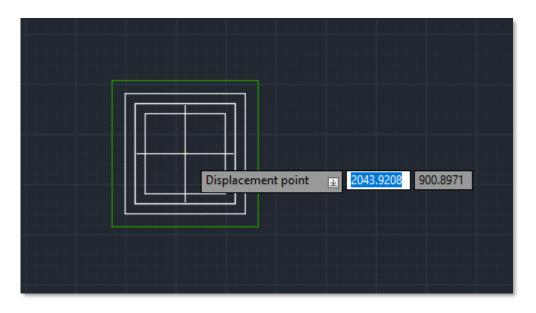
Exhaust roof hood product placement in AutoCAD drawing
